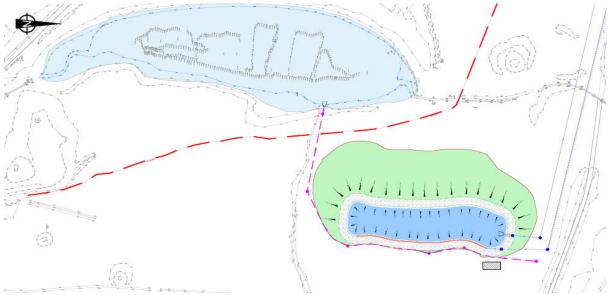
shows the proposed layout for Option 3 (refer to Appendix G for more details).
